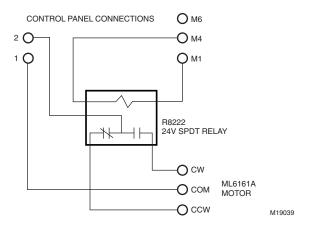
ML6161 Damper Motor Actuator wiring diagram.
